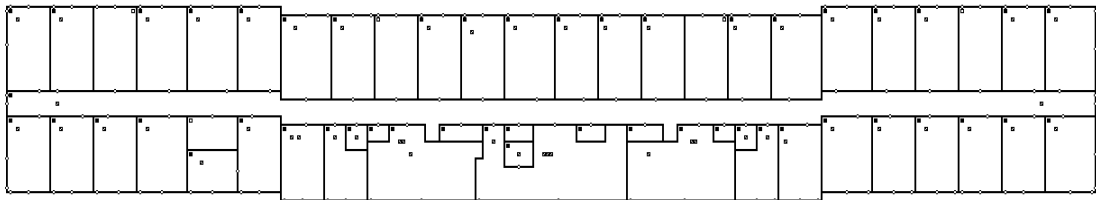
Building A floor plan for upper (resident) floors, as constructed in multi-zone model.
